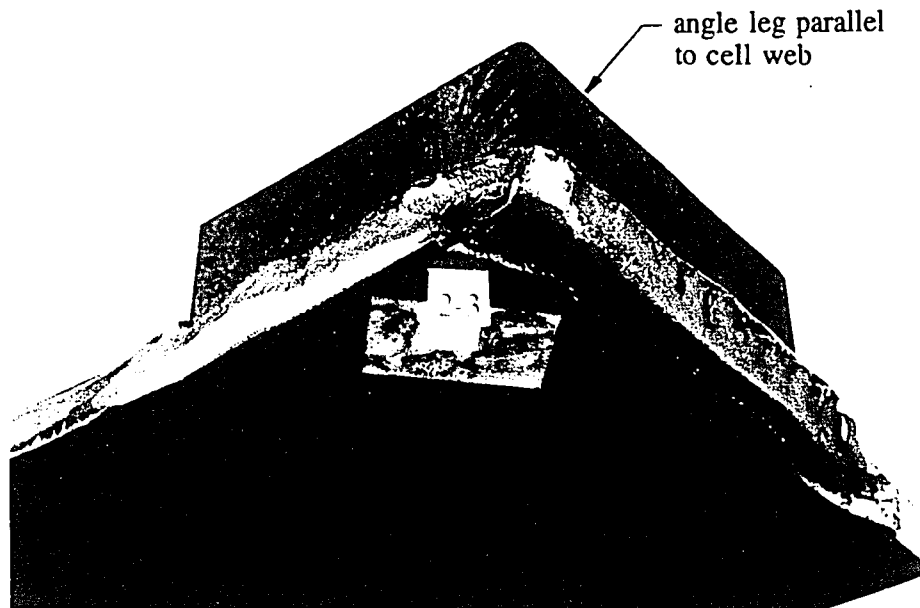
Crack surface of weld that followed the weld toe of both legs of the angle subject to biaxial loading.
